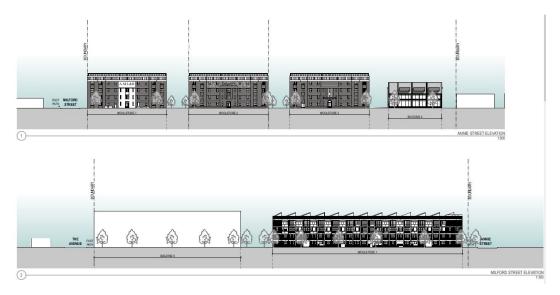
Elevation showing proposed building envelope for building 4 and 5 (Source: TZG Architects)
